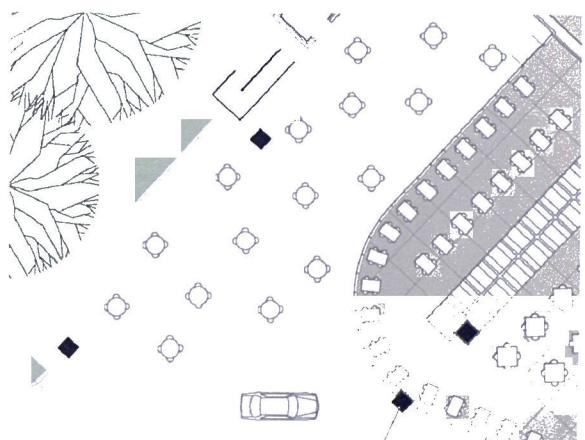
Partial ground floor plan highlighting outdoor dining and restaurant
